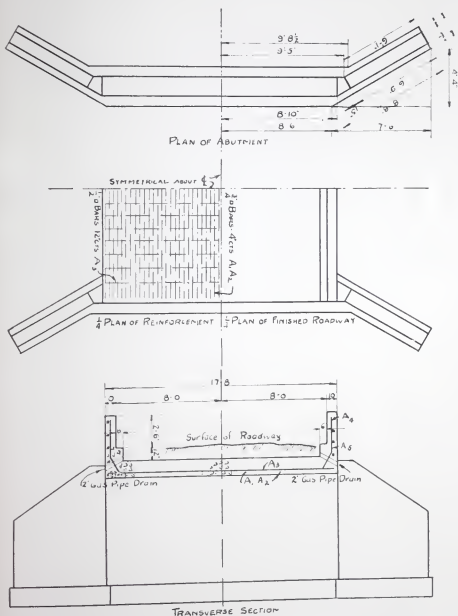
Concrete Bridge of 14-foot span and 16-foot roadway. Designed by the Wisconsin State Highway Commission.
